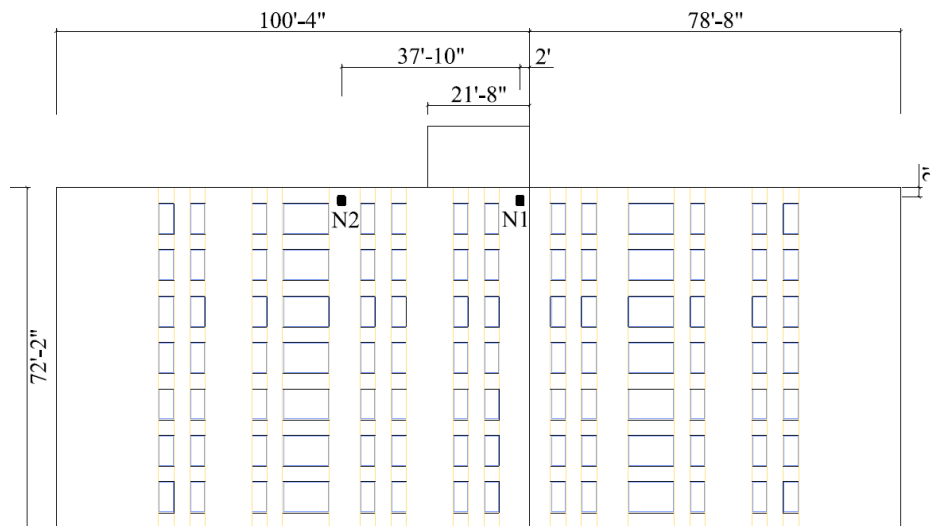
North-east elevation of McLeod House with driving rain gauge locations
